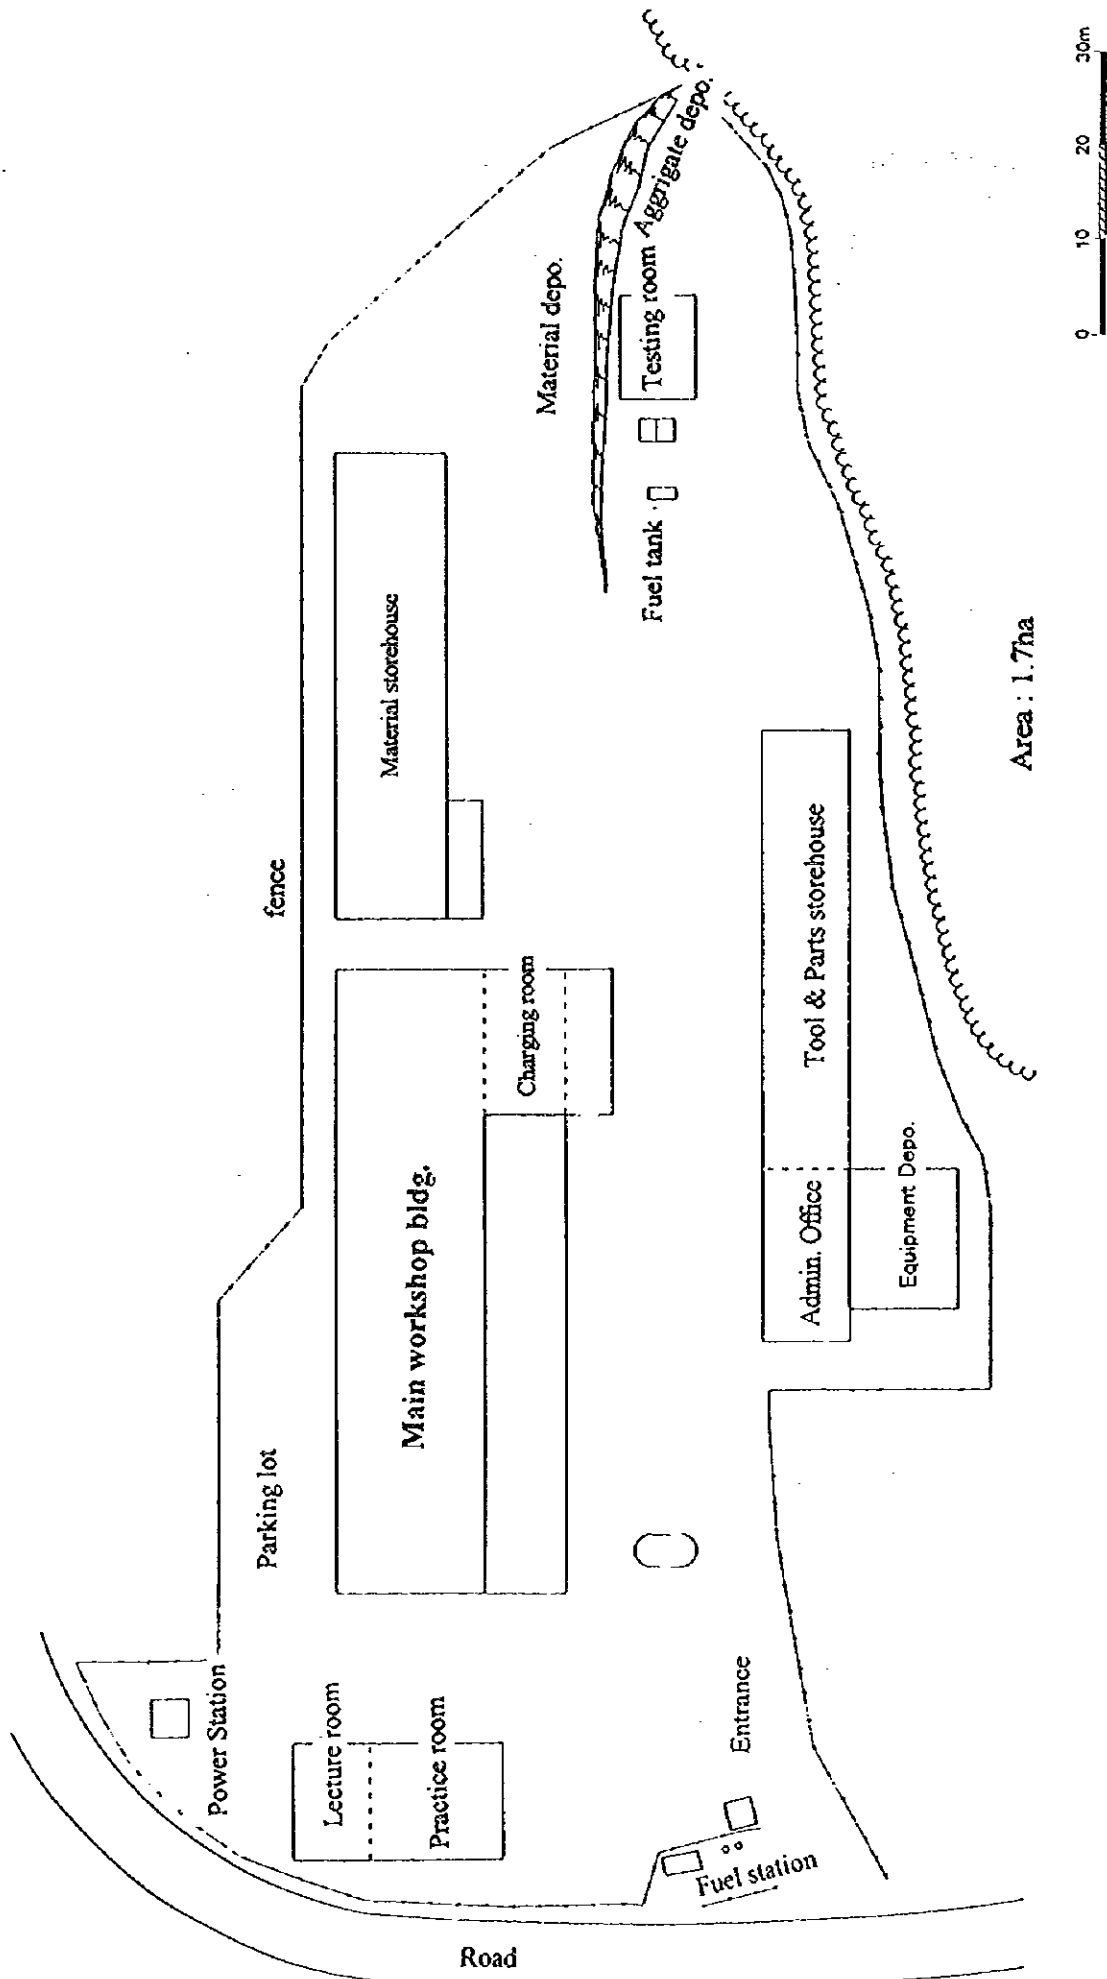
LAYOUT OF SHEFA SUBDIVISION WORKSHOP
